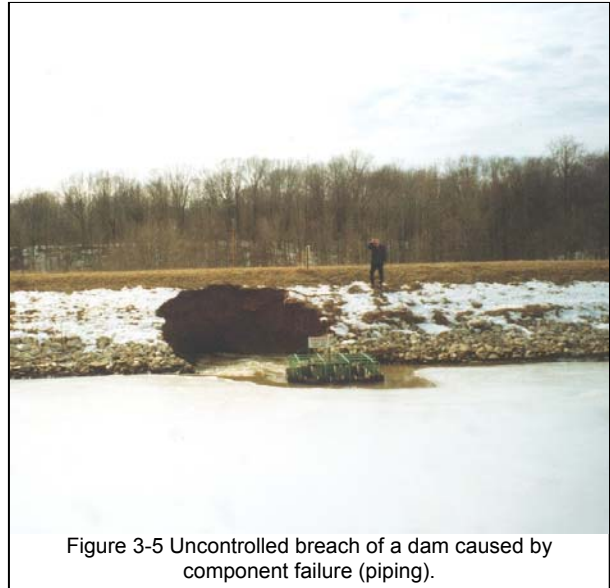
Uncontrolled breach of a dam caused by component failure (piping).
